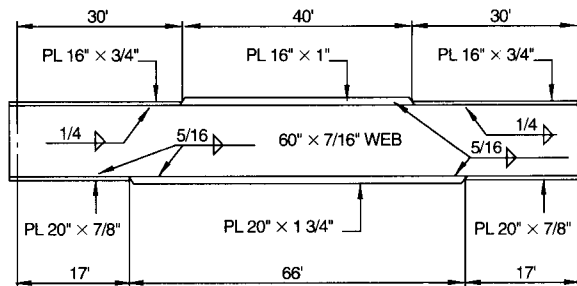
Plate girder with splices in top and bottom flanges.
